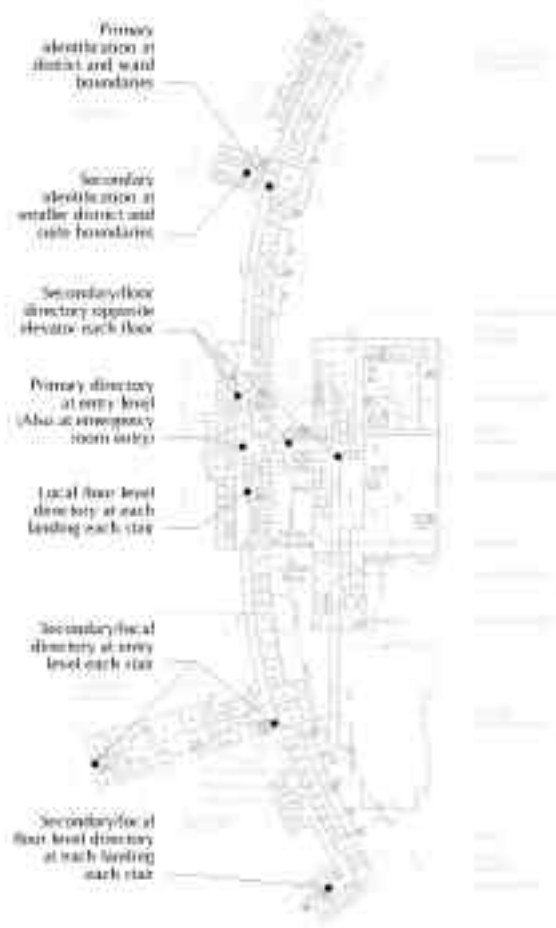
Wuerzburg Hospital, Entry Floor plan of Buildings 345 and 352; showing typical location of primary signage elements
